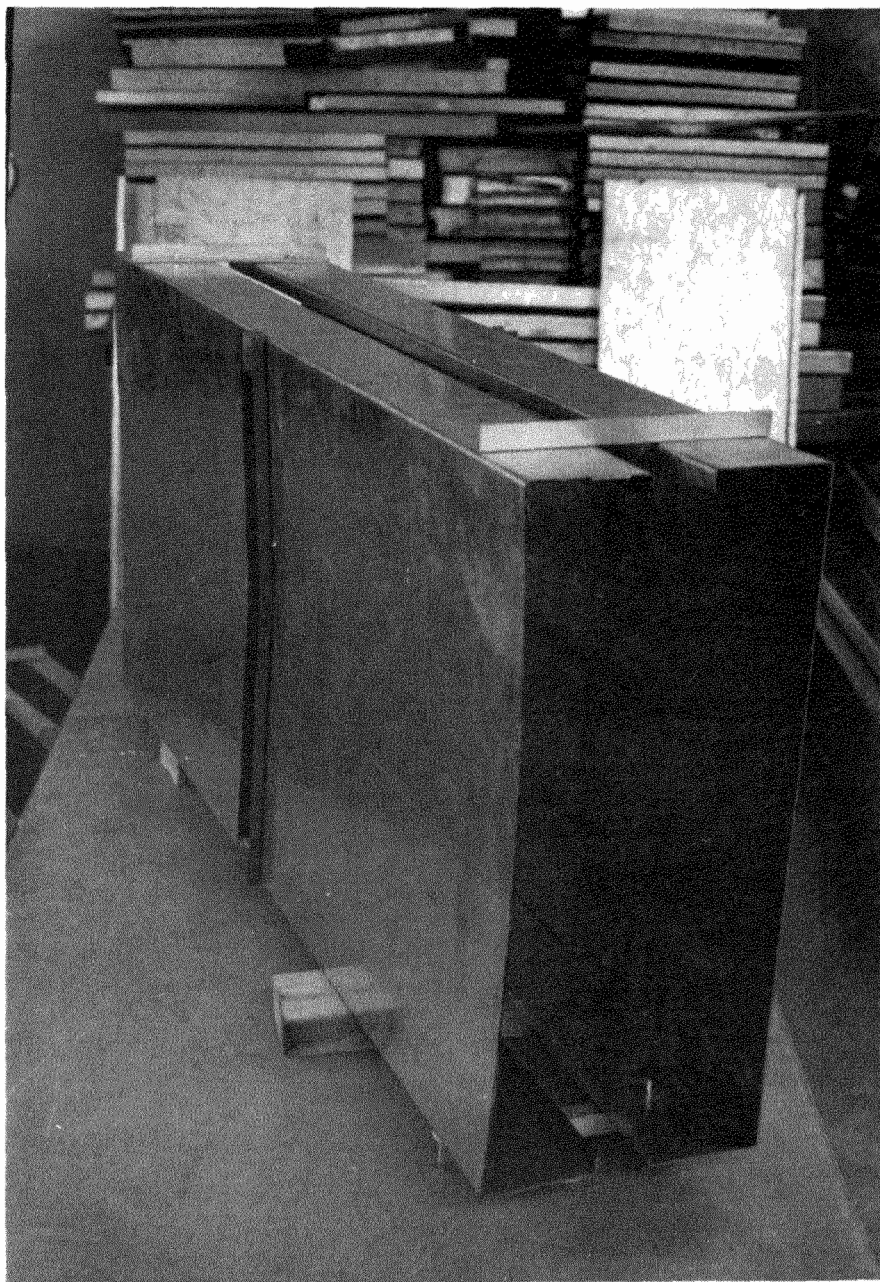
Photograph of Stability Failure Mode for Intermediate Stiffener Tests
